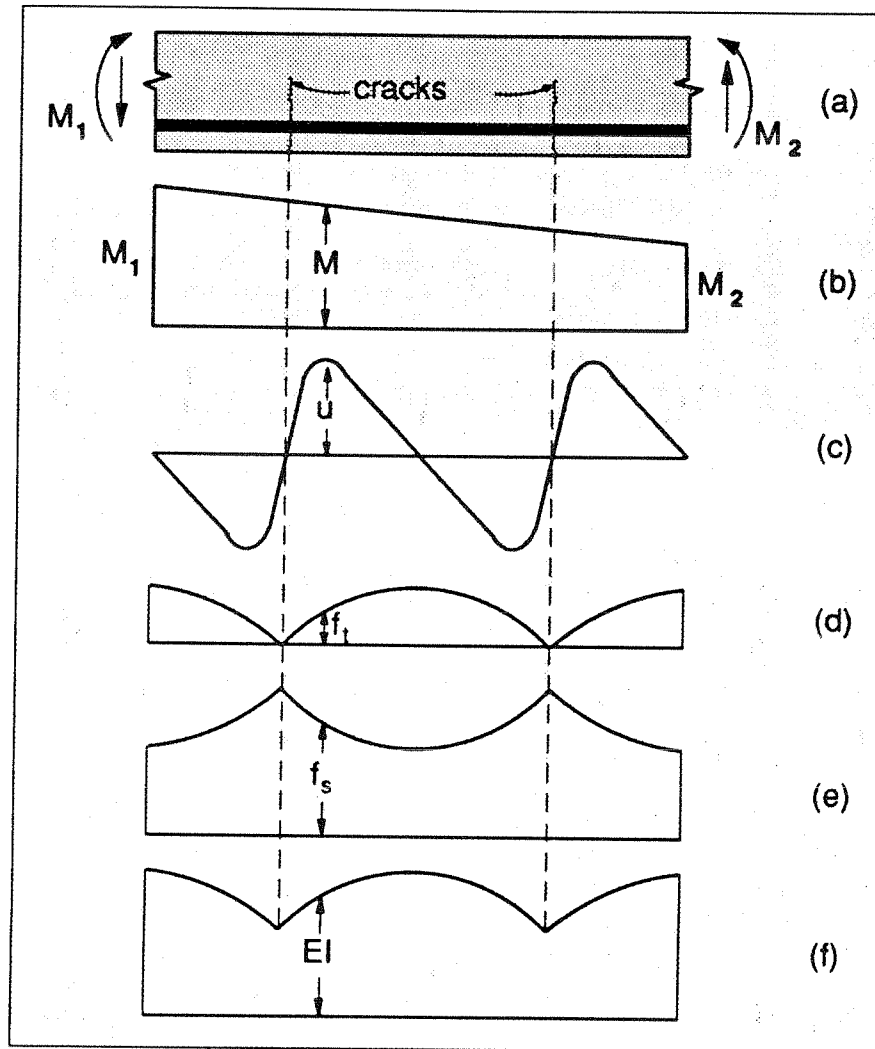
Effect of Cracking in Reinforced Concrete Beam
